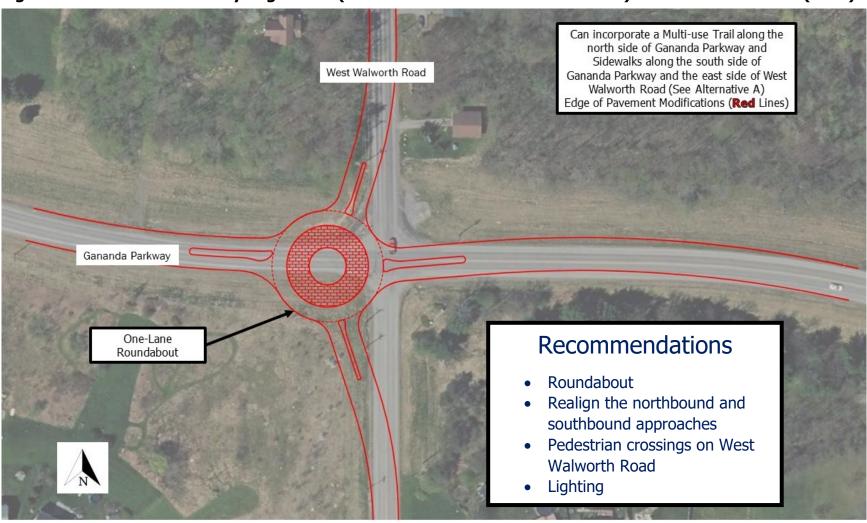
Gananda Parkway Segment 1 (Route 441 to West Walworth Road) - W. Walworth Road (Alt B)
